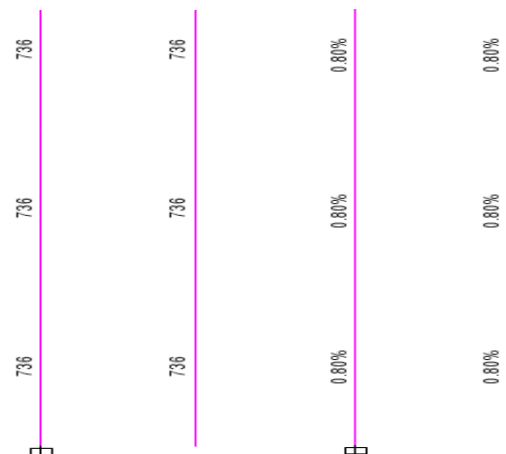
Elevation view of column having longitudinal reinforcement (mm<sup>2</sup>) and P<sub>t</sub> (%) value
